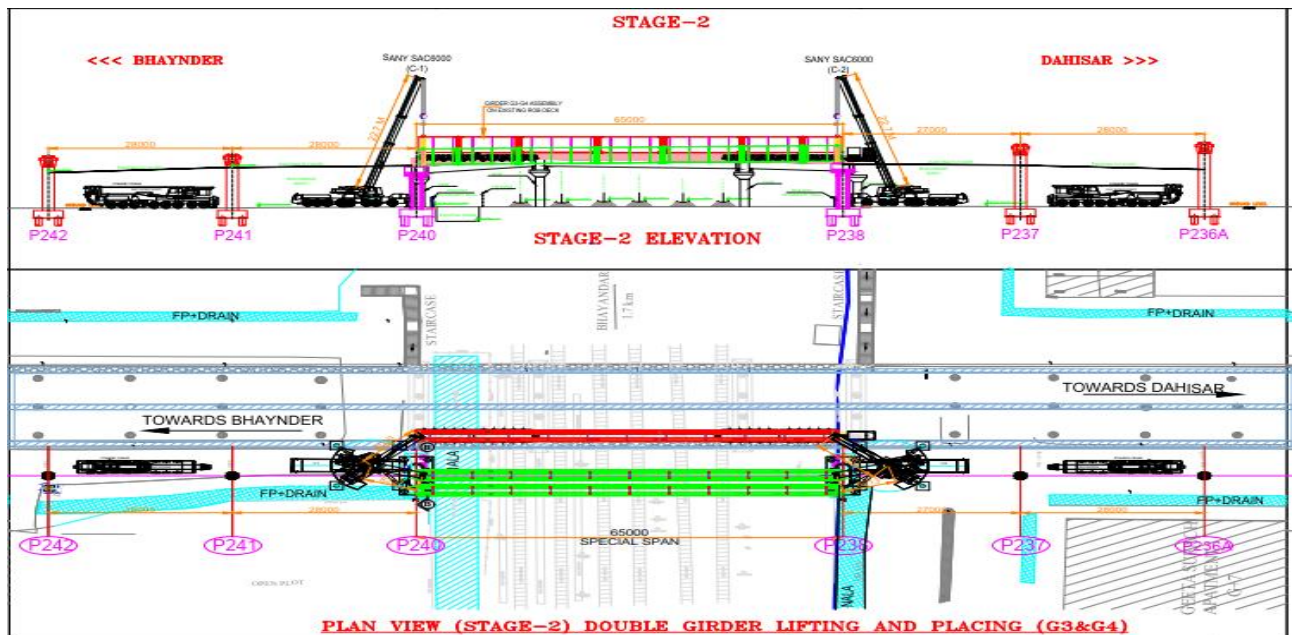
lifting Plan for Stage-II Steel Girder
